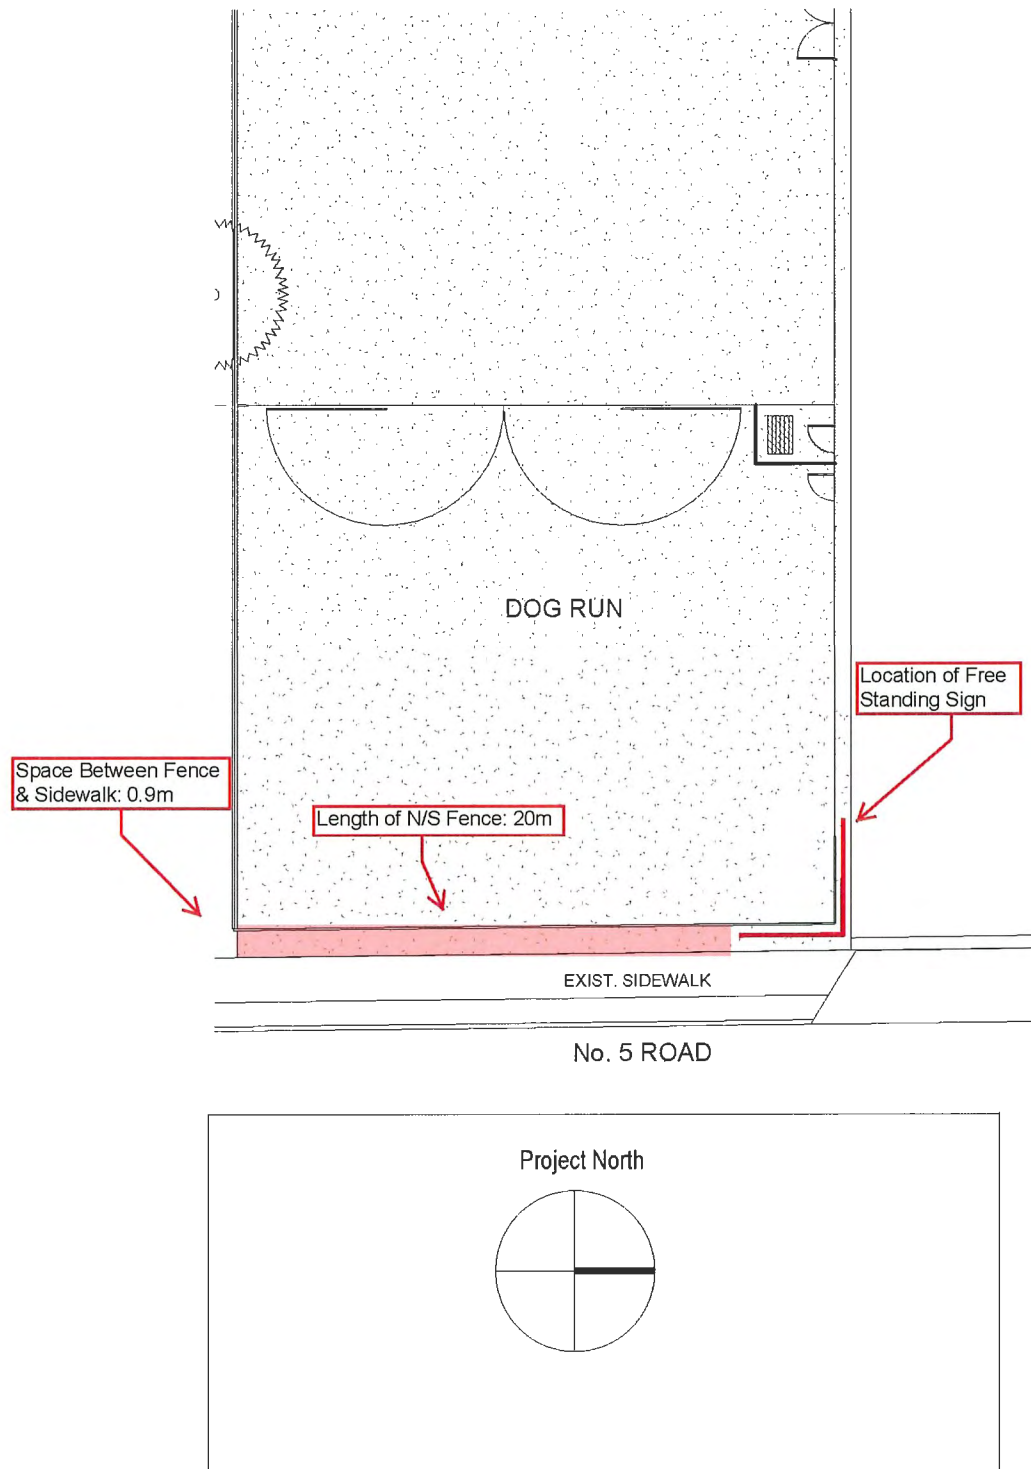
Cropped site plan showing proposed location of public artwork and extent of the east section of chain link fence.
